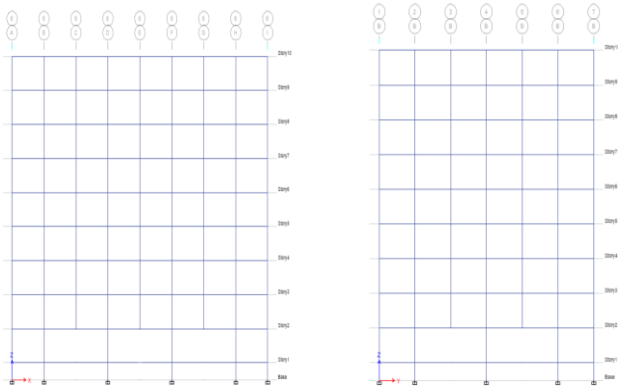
Elevation of FCLSA GL Fig. 3.5 Elevation of FCSSA GL
